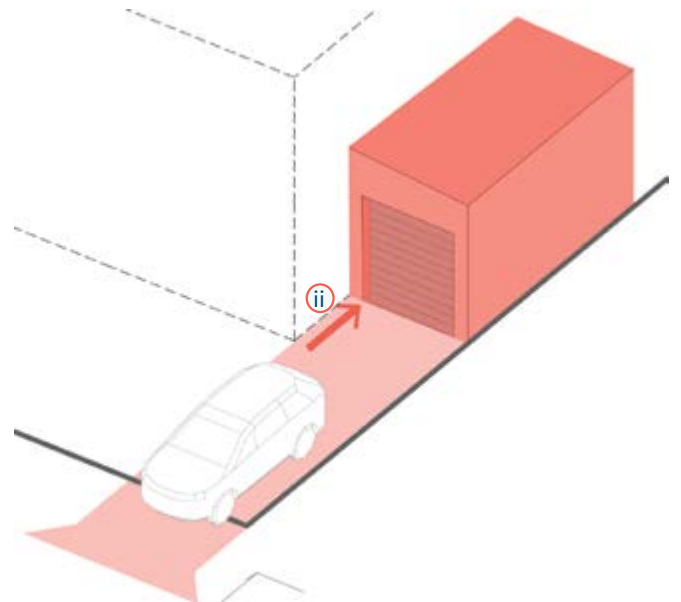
A setback of at least 2m from the building line ensures that garaging does not detract from the streetscapes.
